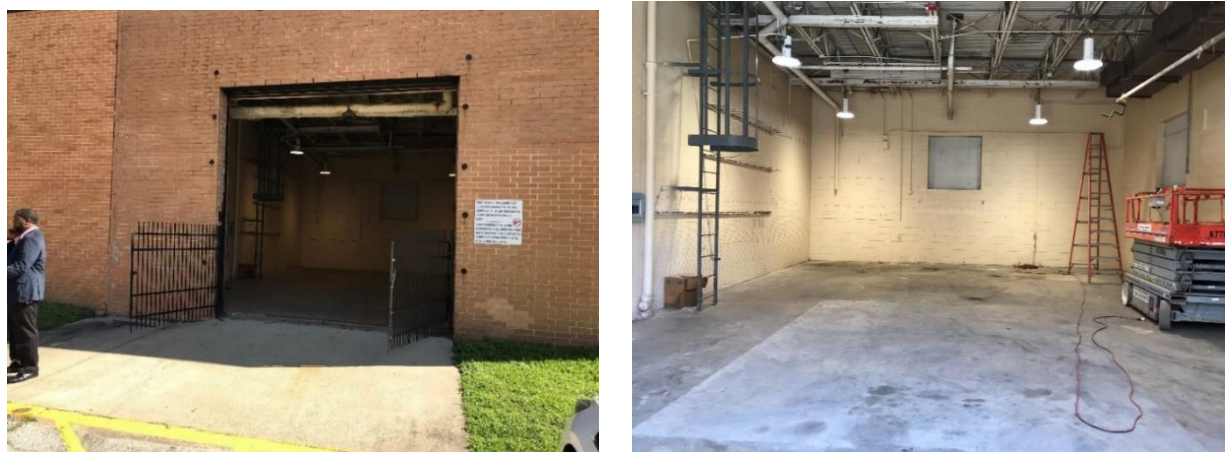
Central Plant Storage Location, Exterior and Interior Storage/Charging
